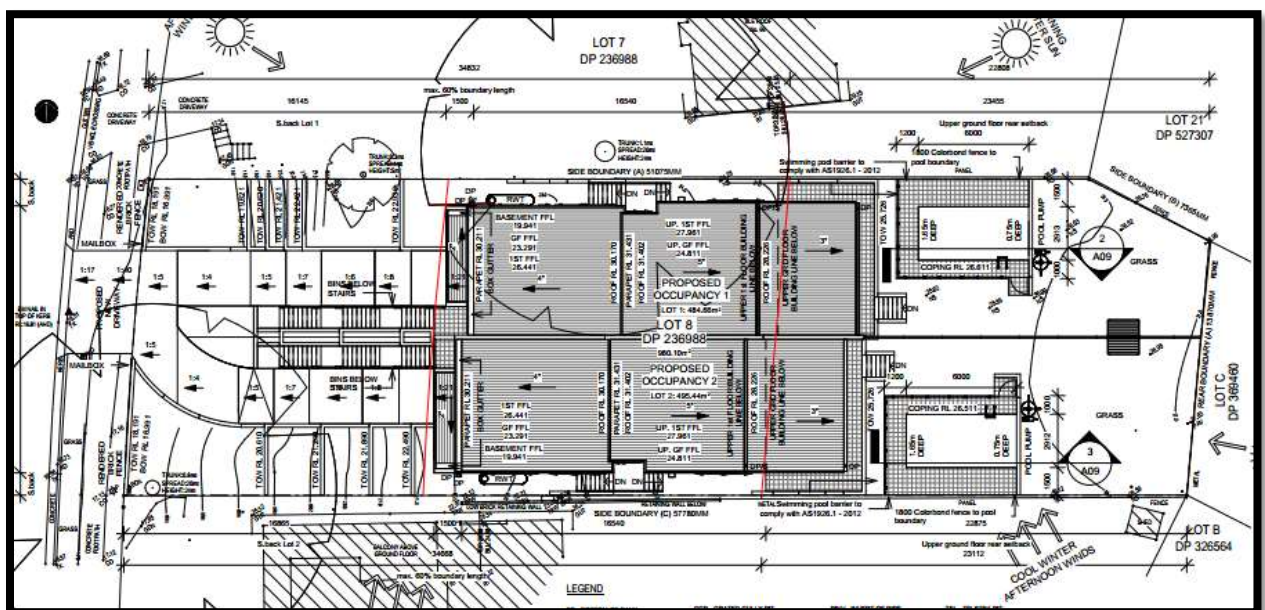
Site Plan at 68 Morshead Drive Connells Point (Source – AUSDAC)
